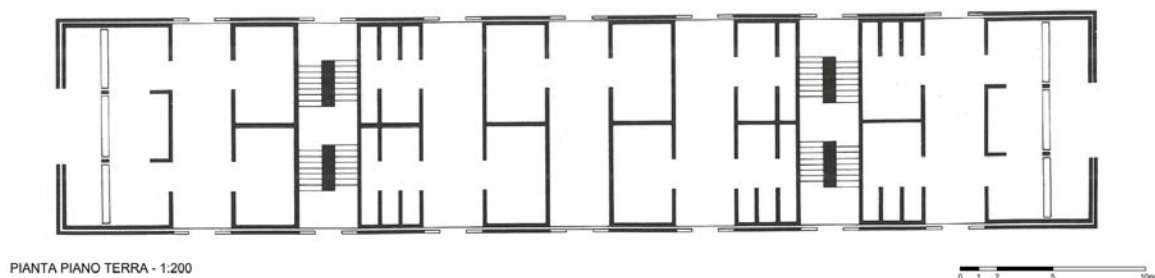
Plan of the ground floor. (Drawing by Studio Vacchini Architetti)
